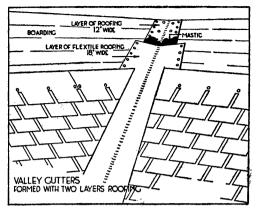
Showing double protection of Flextile roofing strips in valley (D. Anderson & Son Ltd.)
